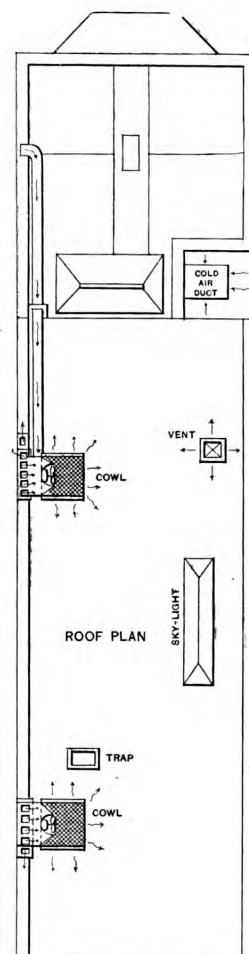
Plan of Roof, Showing Location of Exhaust Fan Ventilators.
